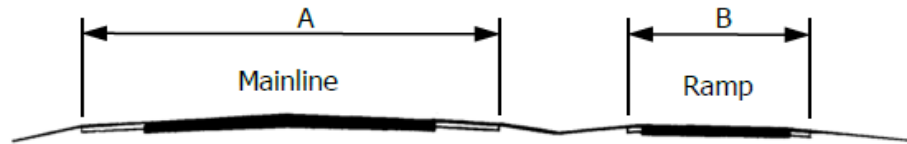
Approach roadway cross-section view for a mainline and a ramp that are carried across one bridge.
